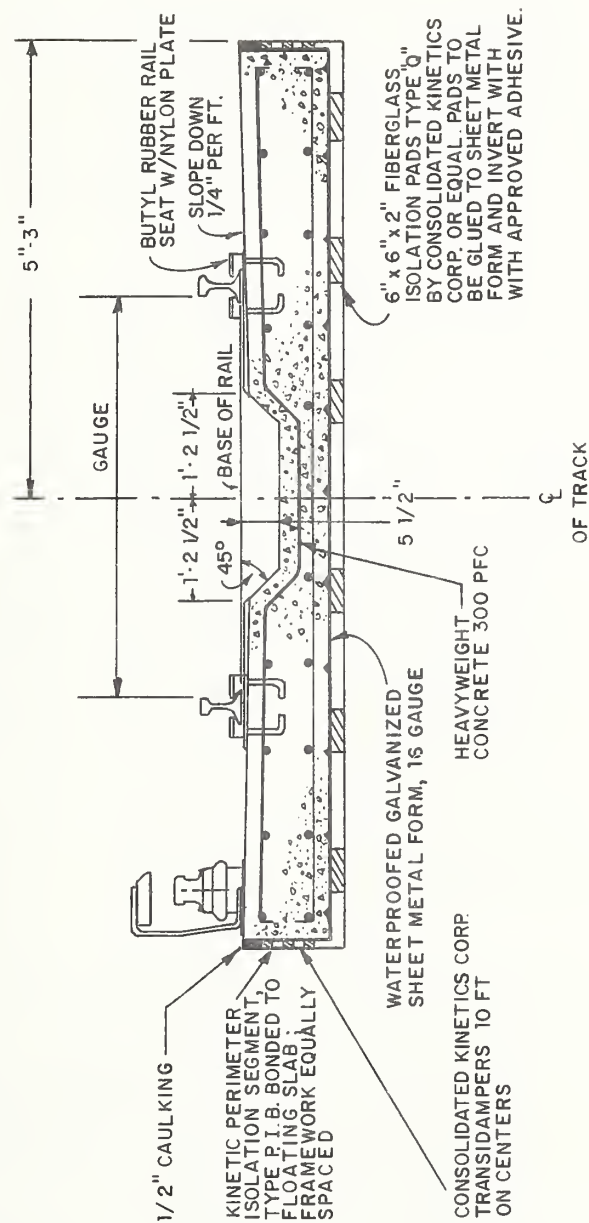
FLOATING-SLAB CROSS SECTION.
